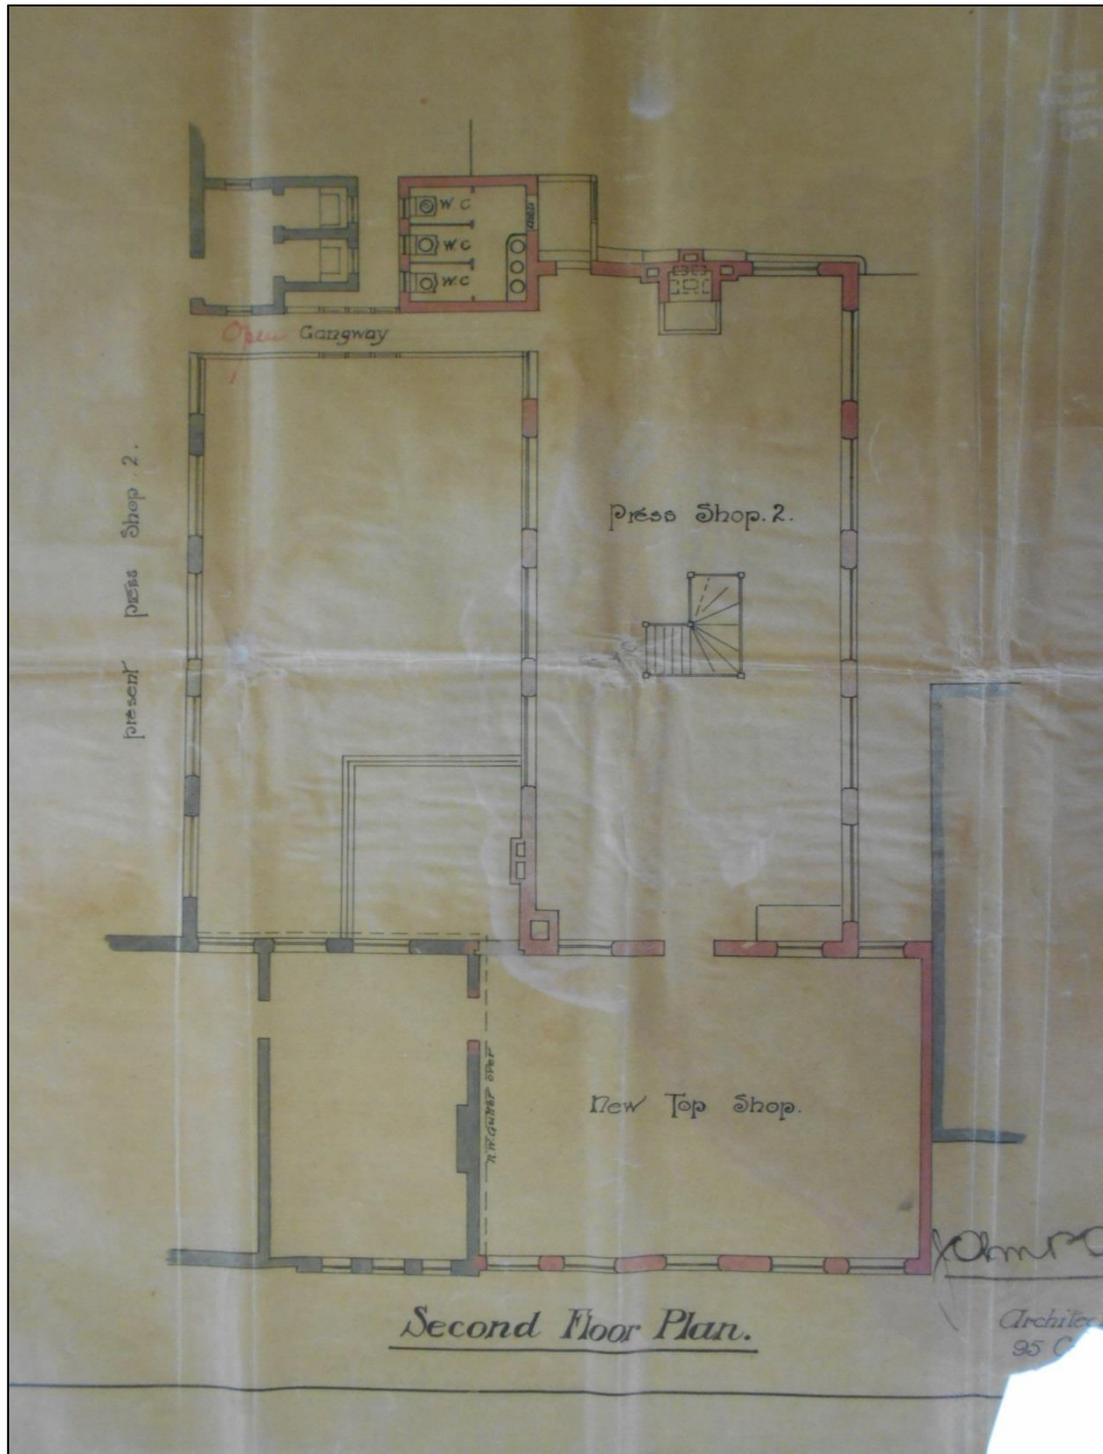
The second floor of the new Unity Works shopping of 1897 (in red). Existing structures are in blue. Note room uses (BA: BBP 13597). The high-level gangways between the ranges of shopping are noted here for the first time.
